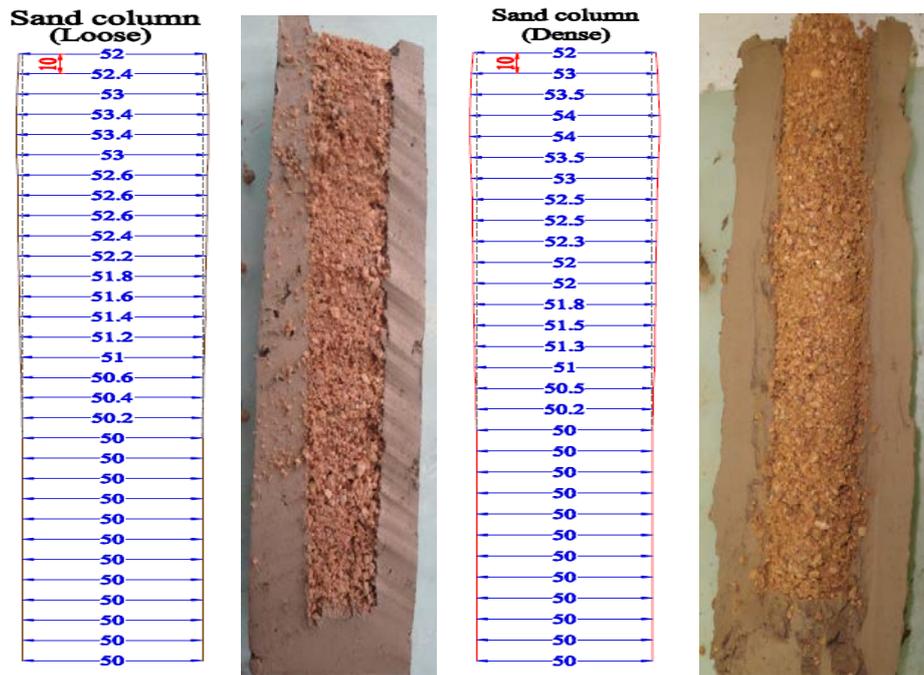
The deformation of floating sand columns at the end of test (all dimensions in mm).
